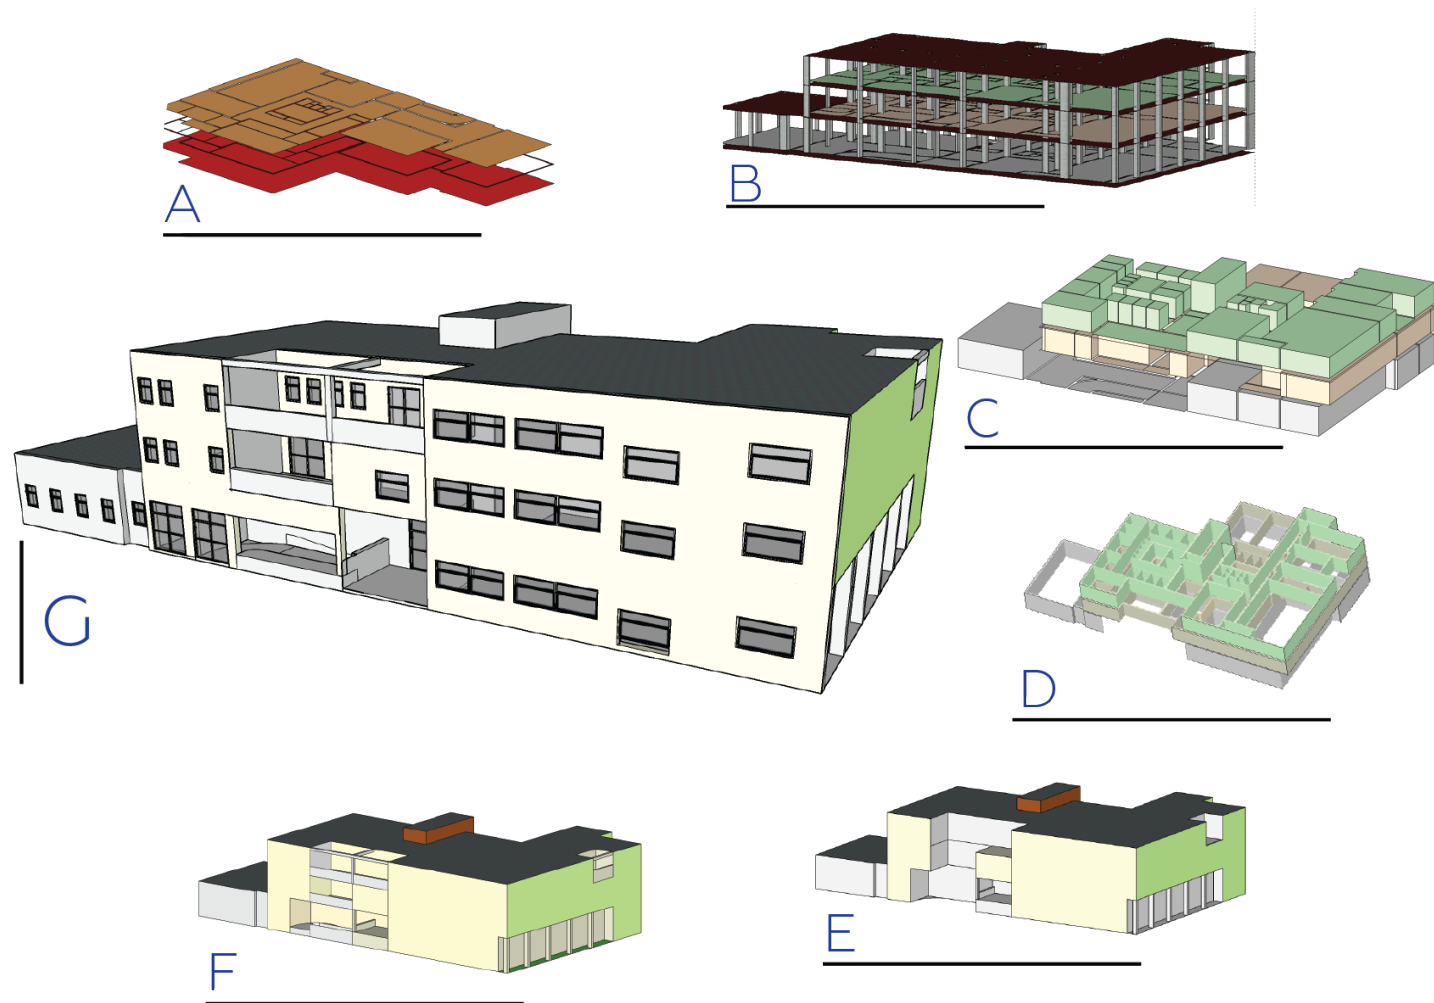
(A) Footprints of groundfloor, footprints of rooms and walls of groundfloor designed in SU from 2D architectural plan, (B) interior building installations, (C) Rooms of Veis building as solids, (D) Decomposition of rooms to walls, (E) building shell part of Veis building, (F) building shell part with the exterior building installations
